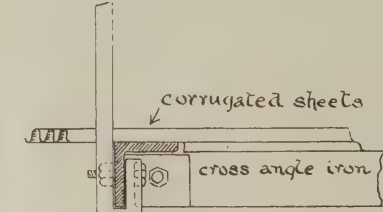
Method of Supporting a Fireproof Scaffold.
